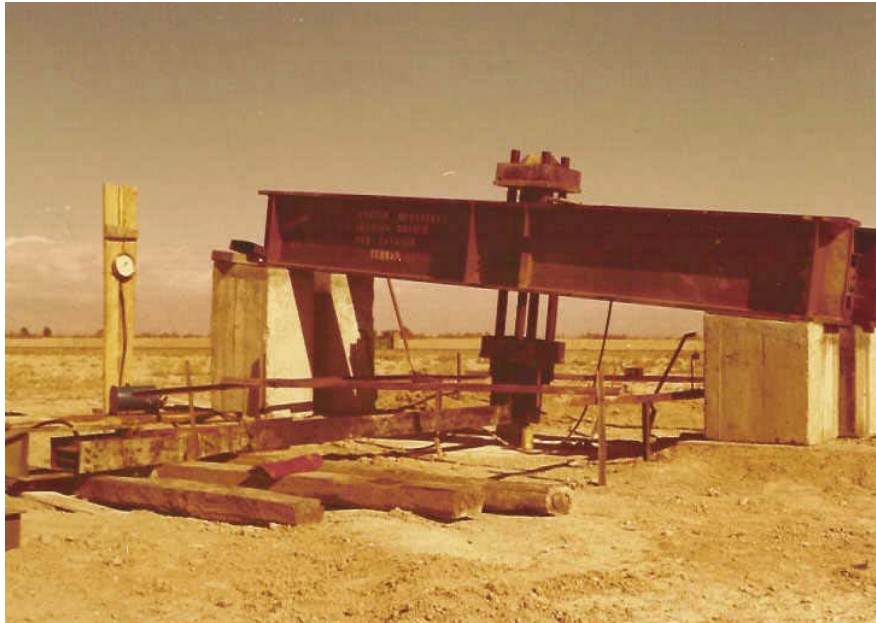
Full-scale foundation uplift loading test arrangement
